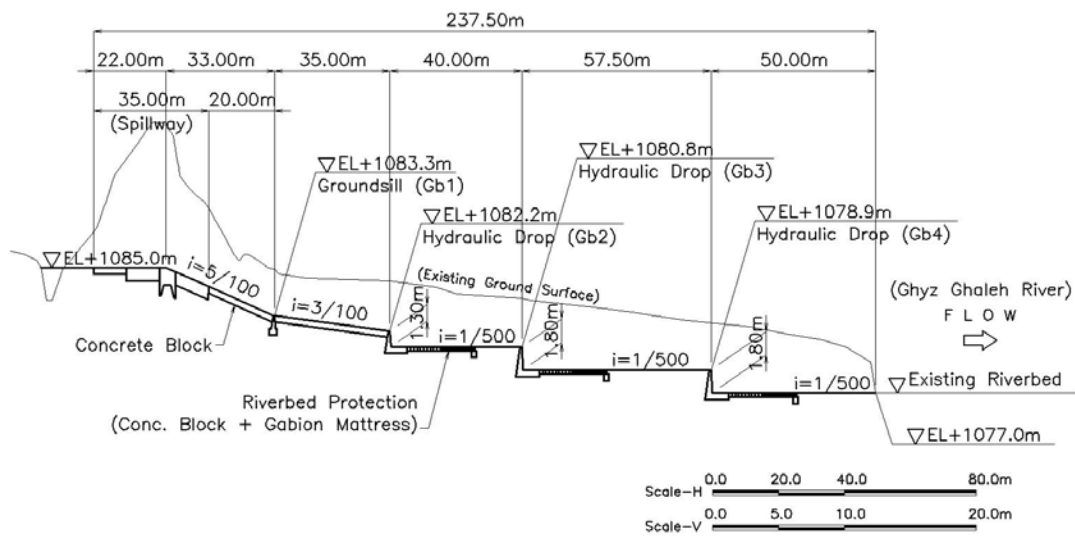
Plan of Proposed Sediment Control Dam Works
